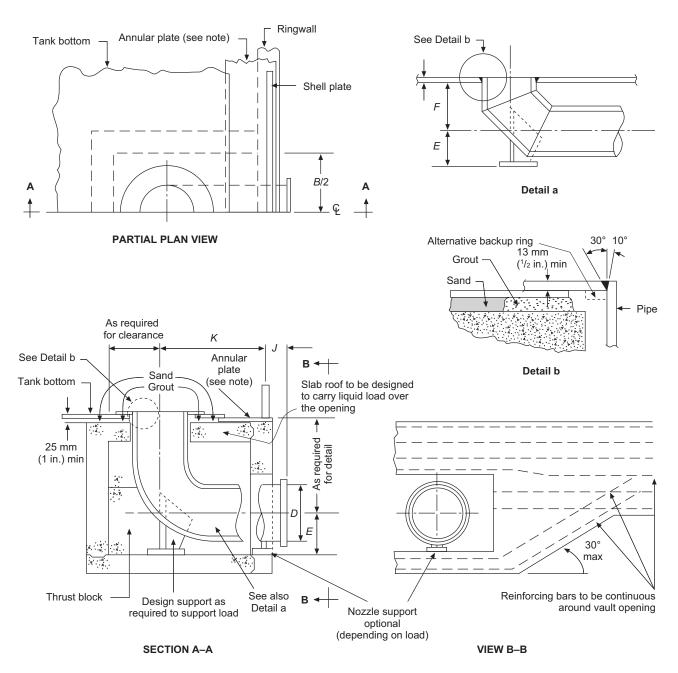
Example of Under-Bottom Connection with Concrete Ringwall Foundation
